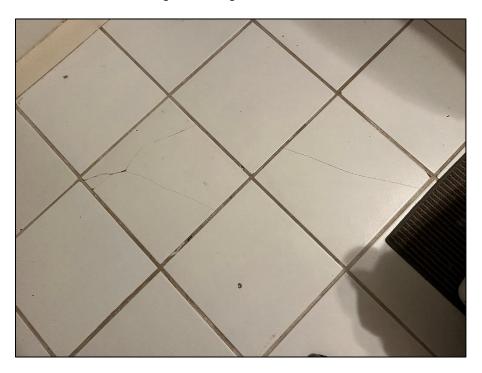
Typical view of loose tile and cracking within the tile flooring.
